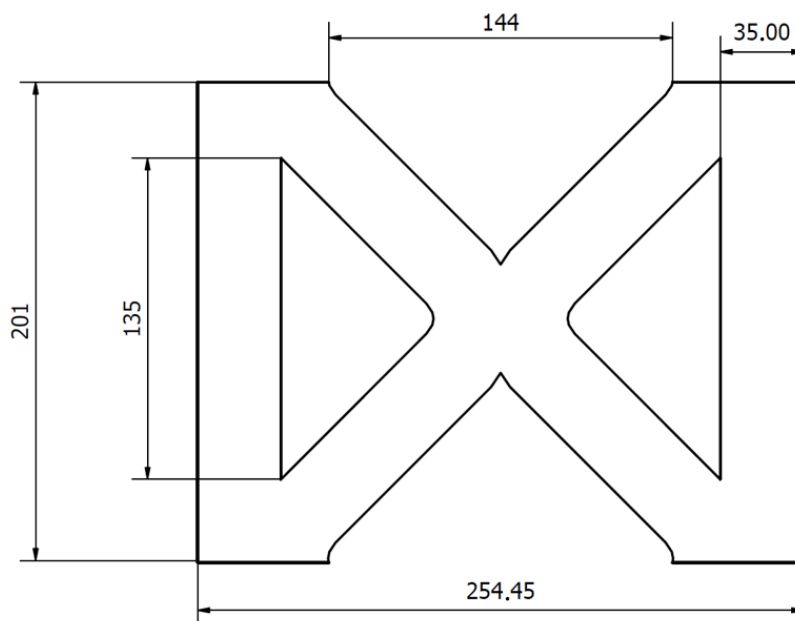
Main dimensions in mm of 3D printed foam concrete wall section
